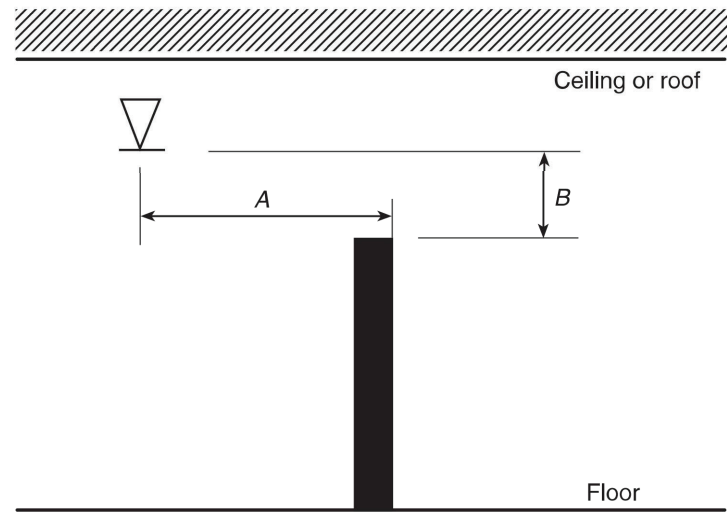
Suspended or Floor-Mounted Obstruction in Light Hazard Occupancies Only (SSU/SSP).
